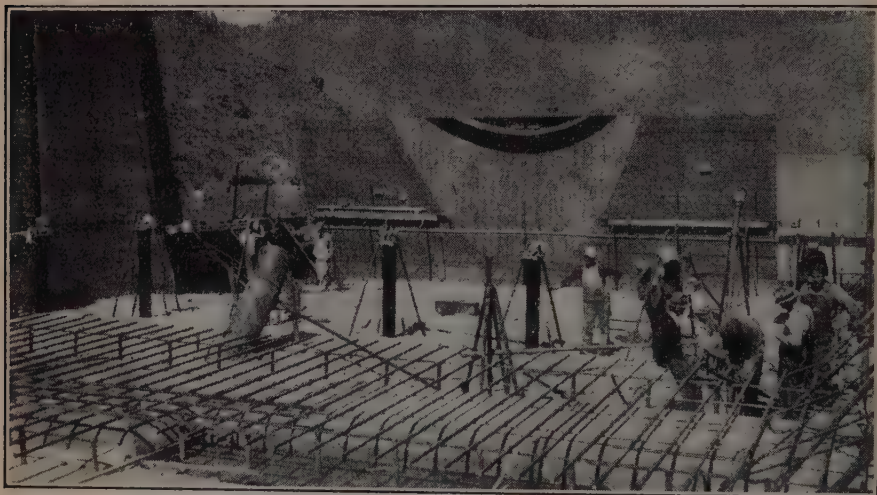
TYPICAL REINFORCEMENT OVER ROOF OF INSPECTION GALLERY
